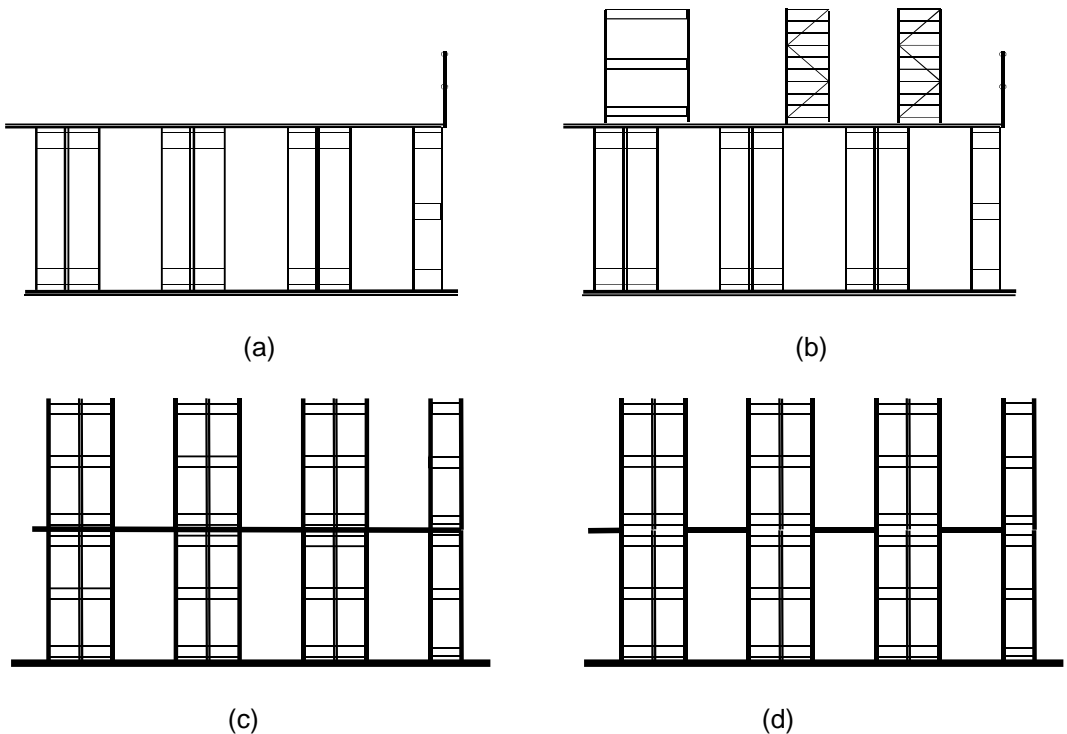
Rack supported floor: a) over-rack mezzanine floor, b) over-rack mezzanine floor supporting shelving, c) multi-tier shelf racking d) walkways suspended between the upright frames [5]
